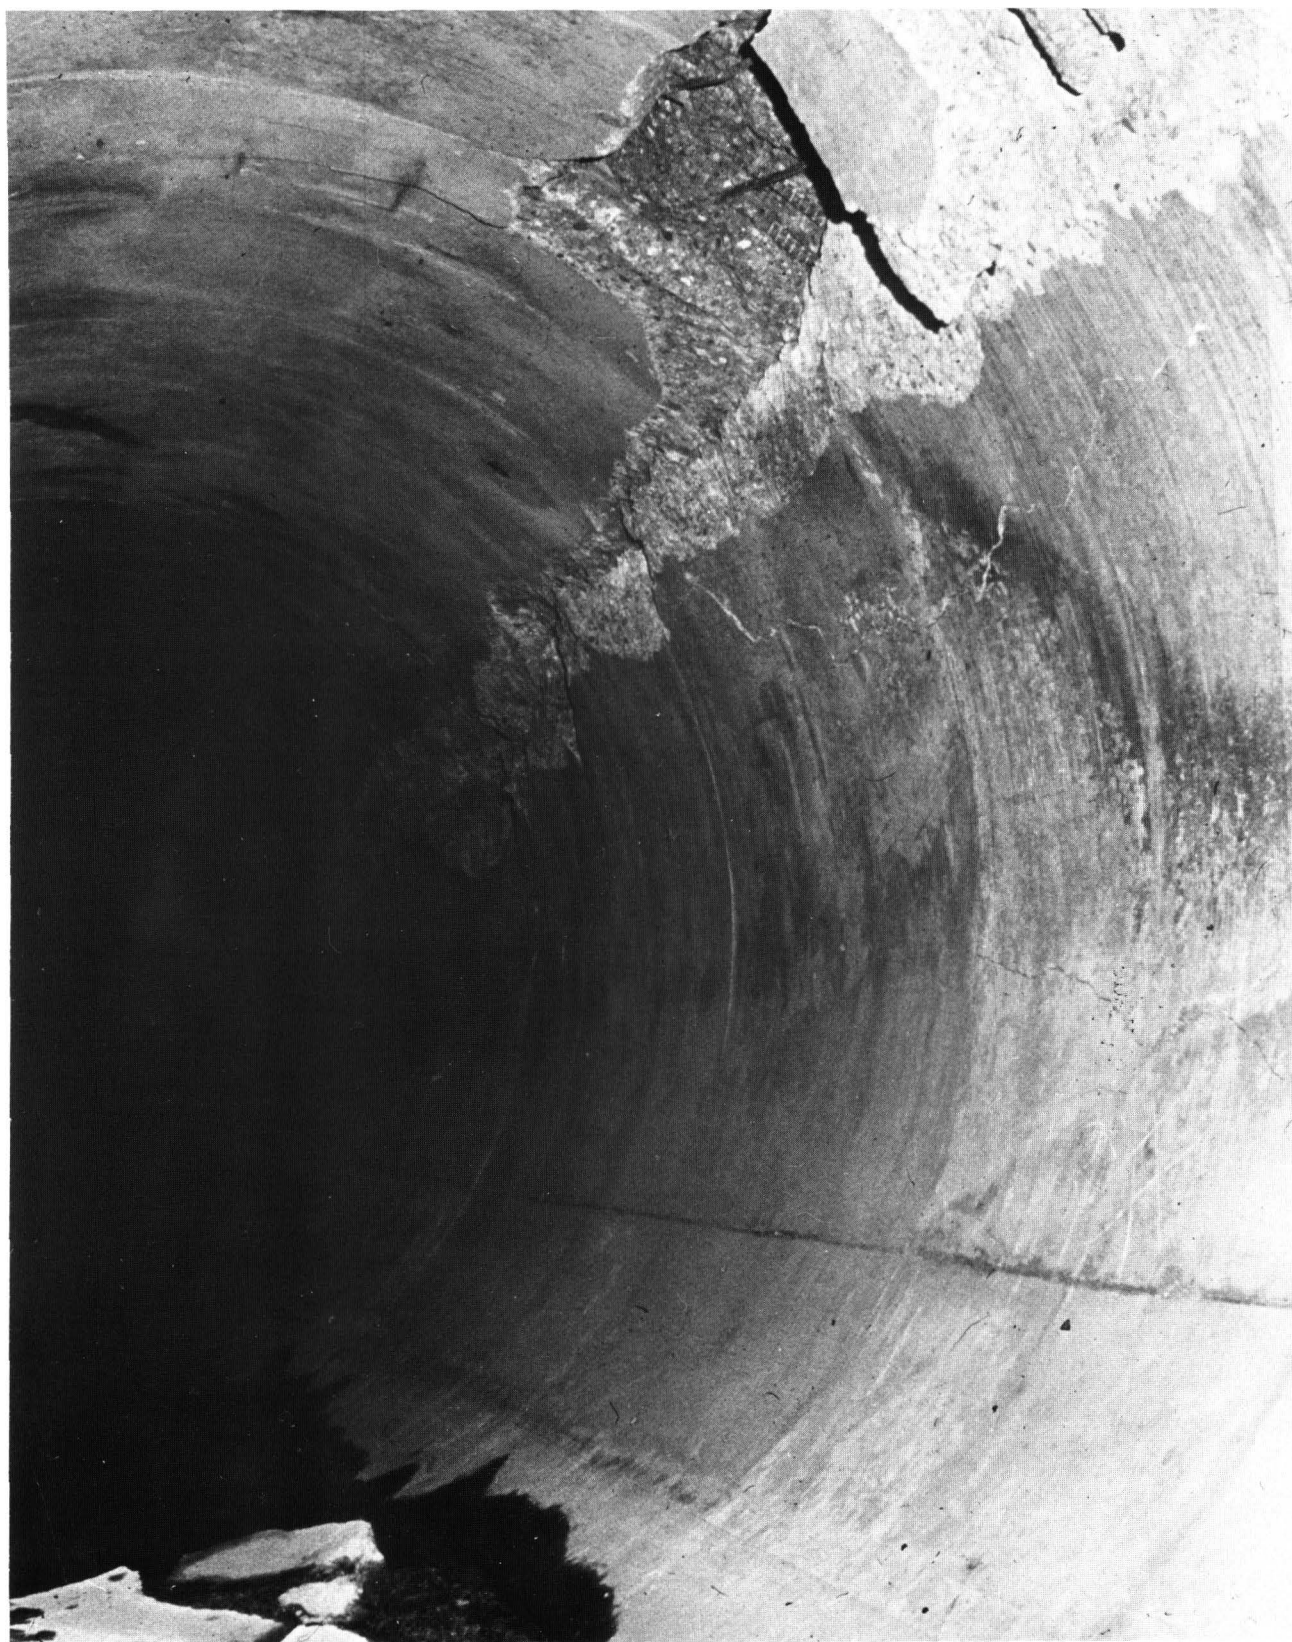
Metropolitan Water District, Balboa Inlet Tunnel. View from inside the tunnel approximately 1600 feet from the south portal showing damage to the tunnel lining. MWD photograph.
